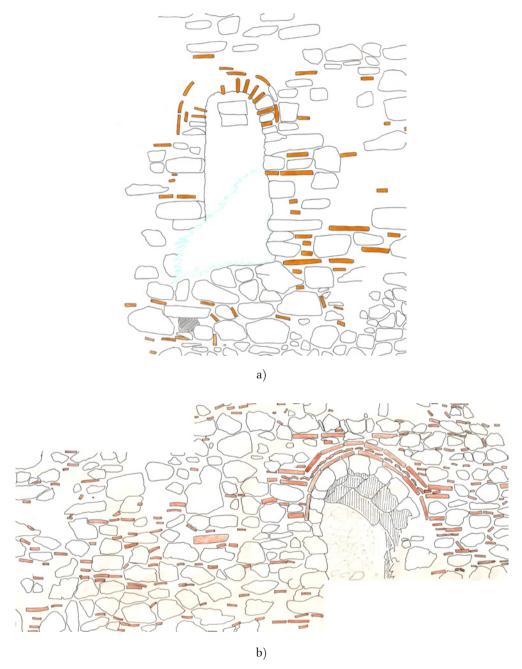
Castle of Vonitsa, inner enceinte. Drawings of sections of masonry.
